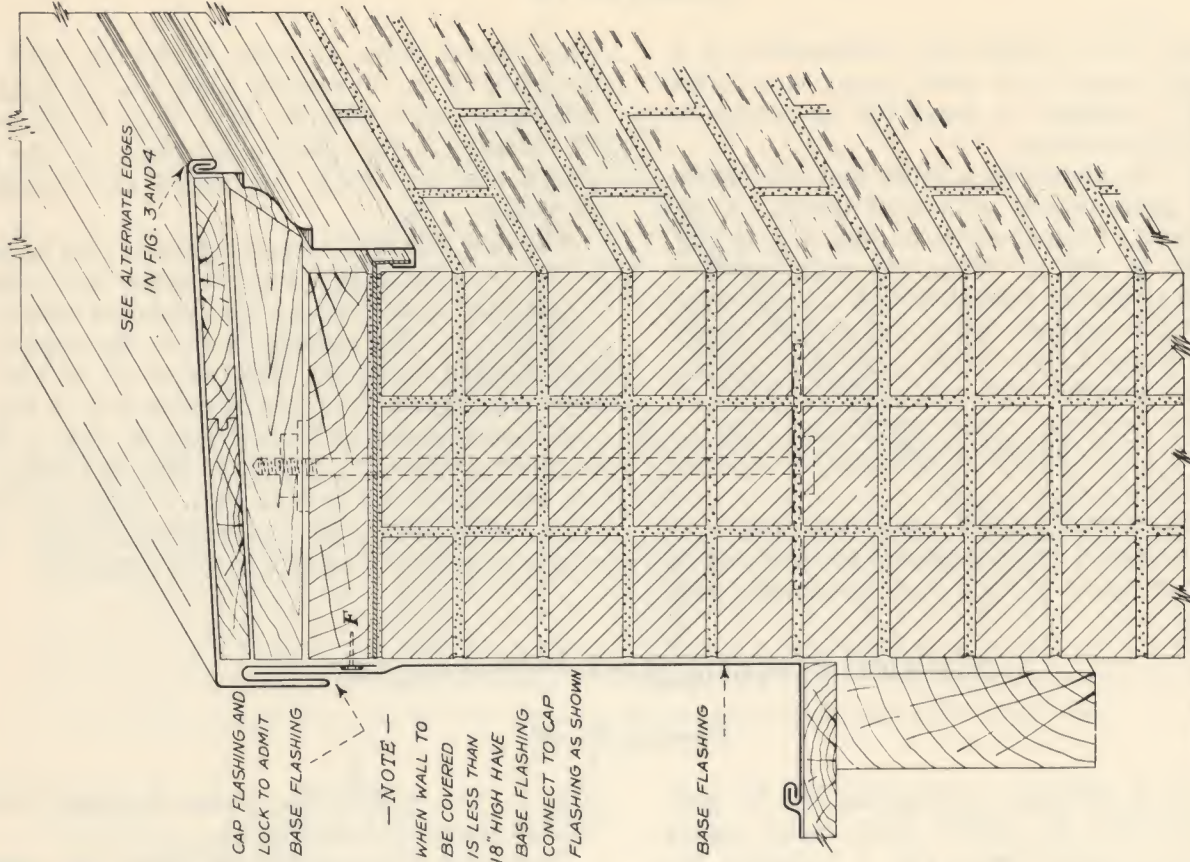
METHOD OF CONSTRUCTING MOLDED SHEET METAL COPING
